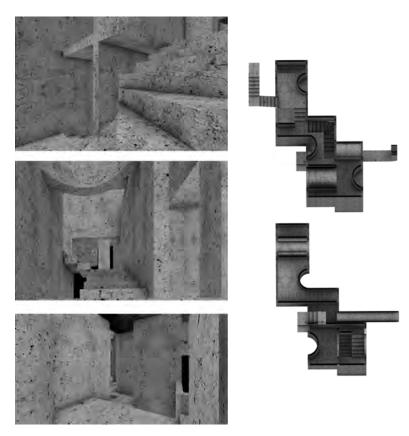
Staircase Connecting Outdoor and Underground Spaces
